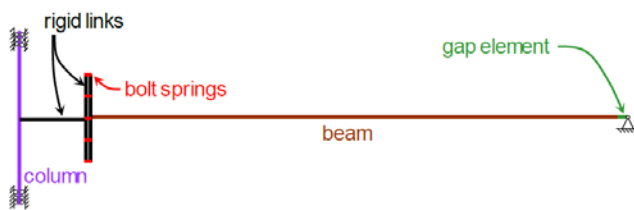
Reduced Model of Two-Span Assembly [20].
